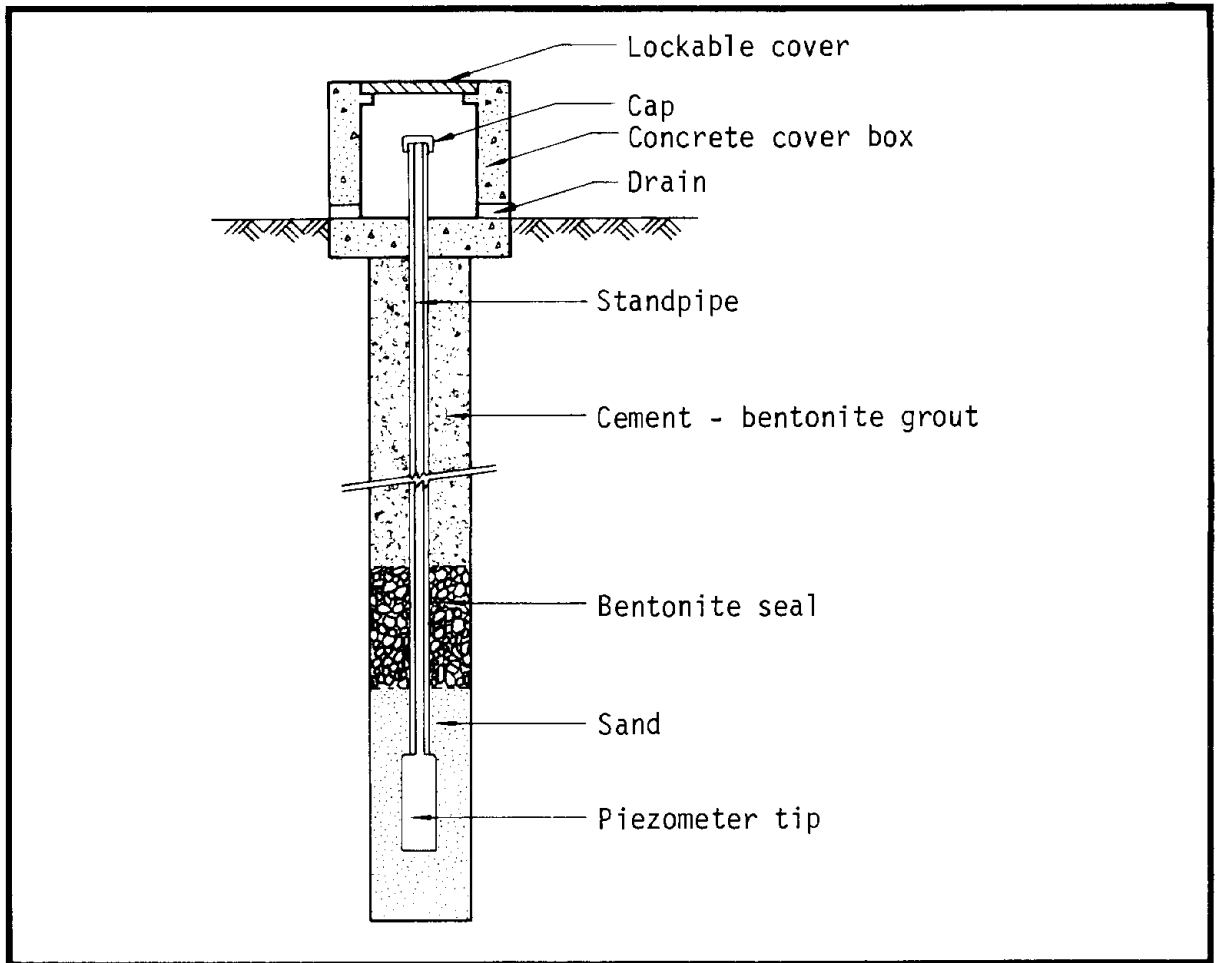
Open Hydraulic (Casagrande) Piezometer
